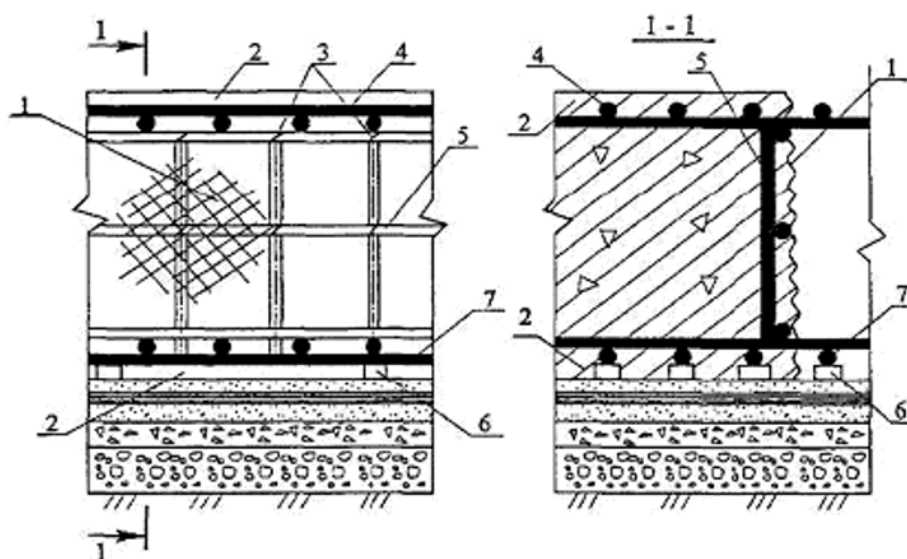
Construction joint structure: 1 - metal grid; 2 - protective concrete layer;
